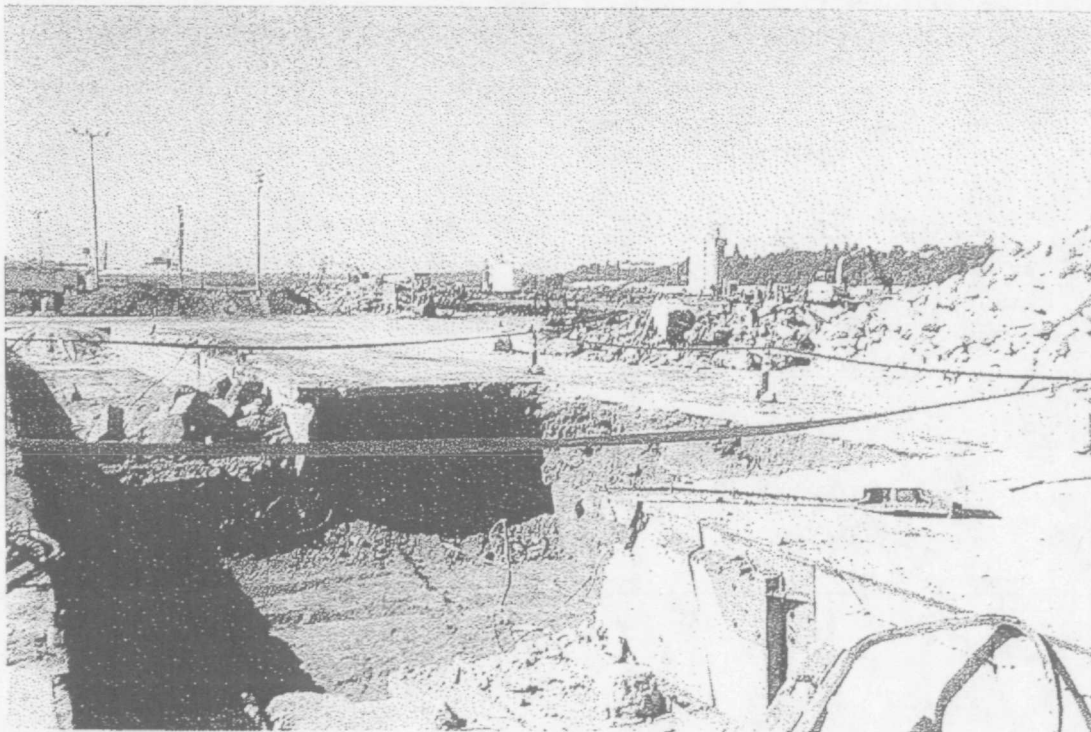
Over-excavation at Area 1 (Warehouse 104, looking northwest).
